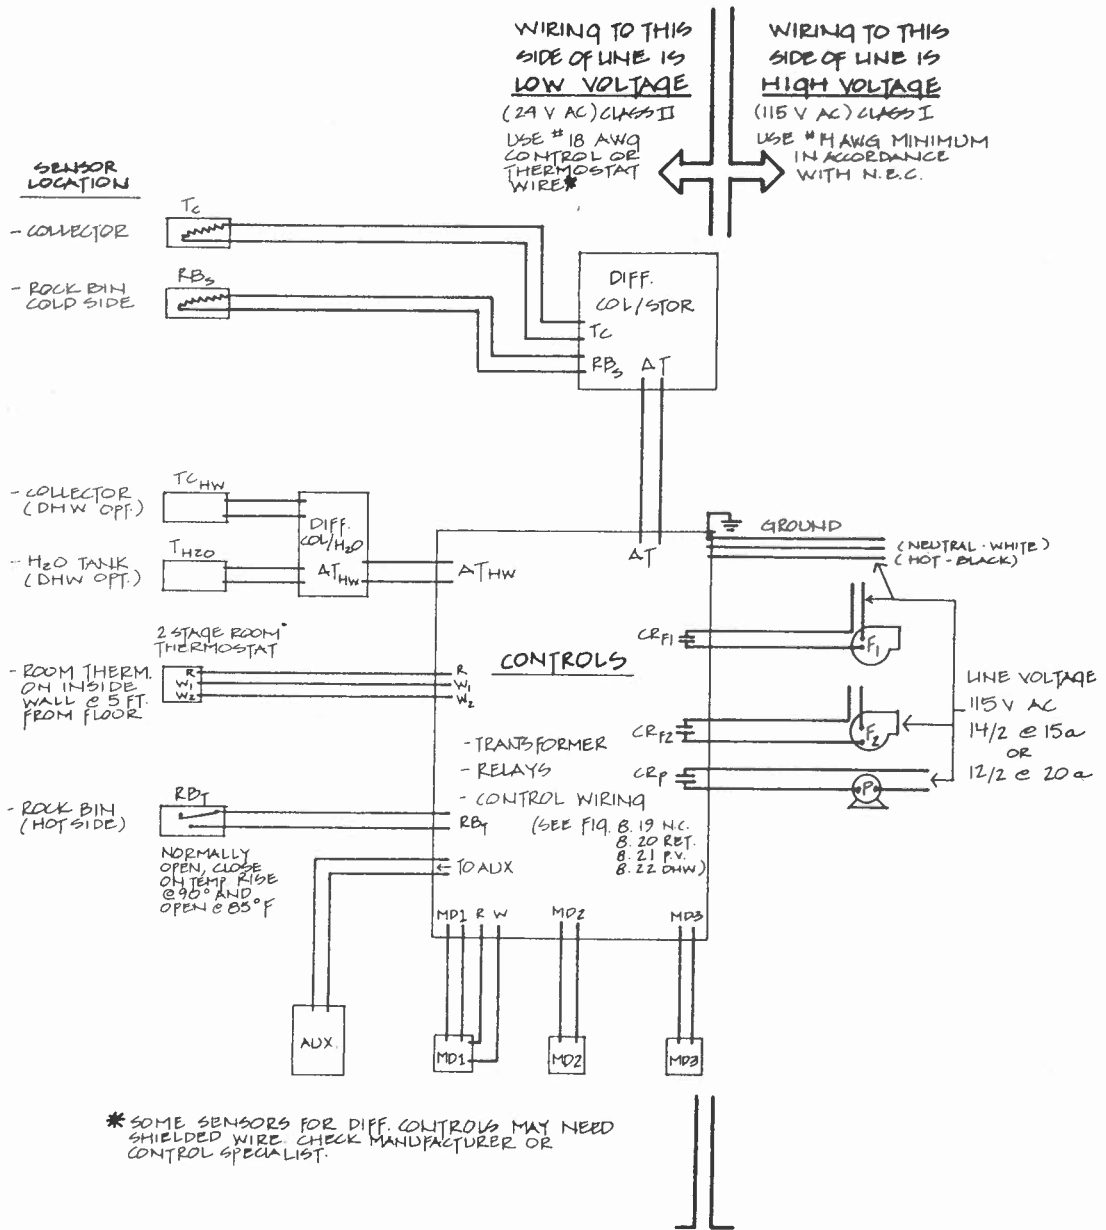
Field Wiring for Wall Collector With Storage and DHW
